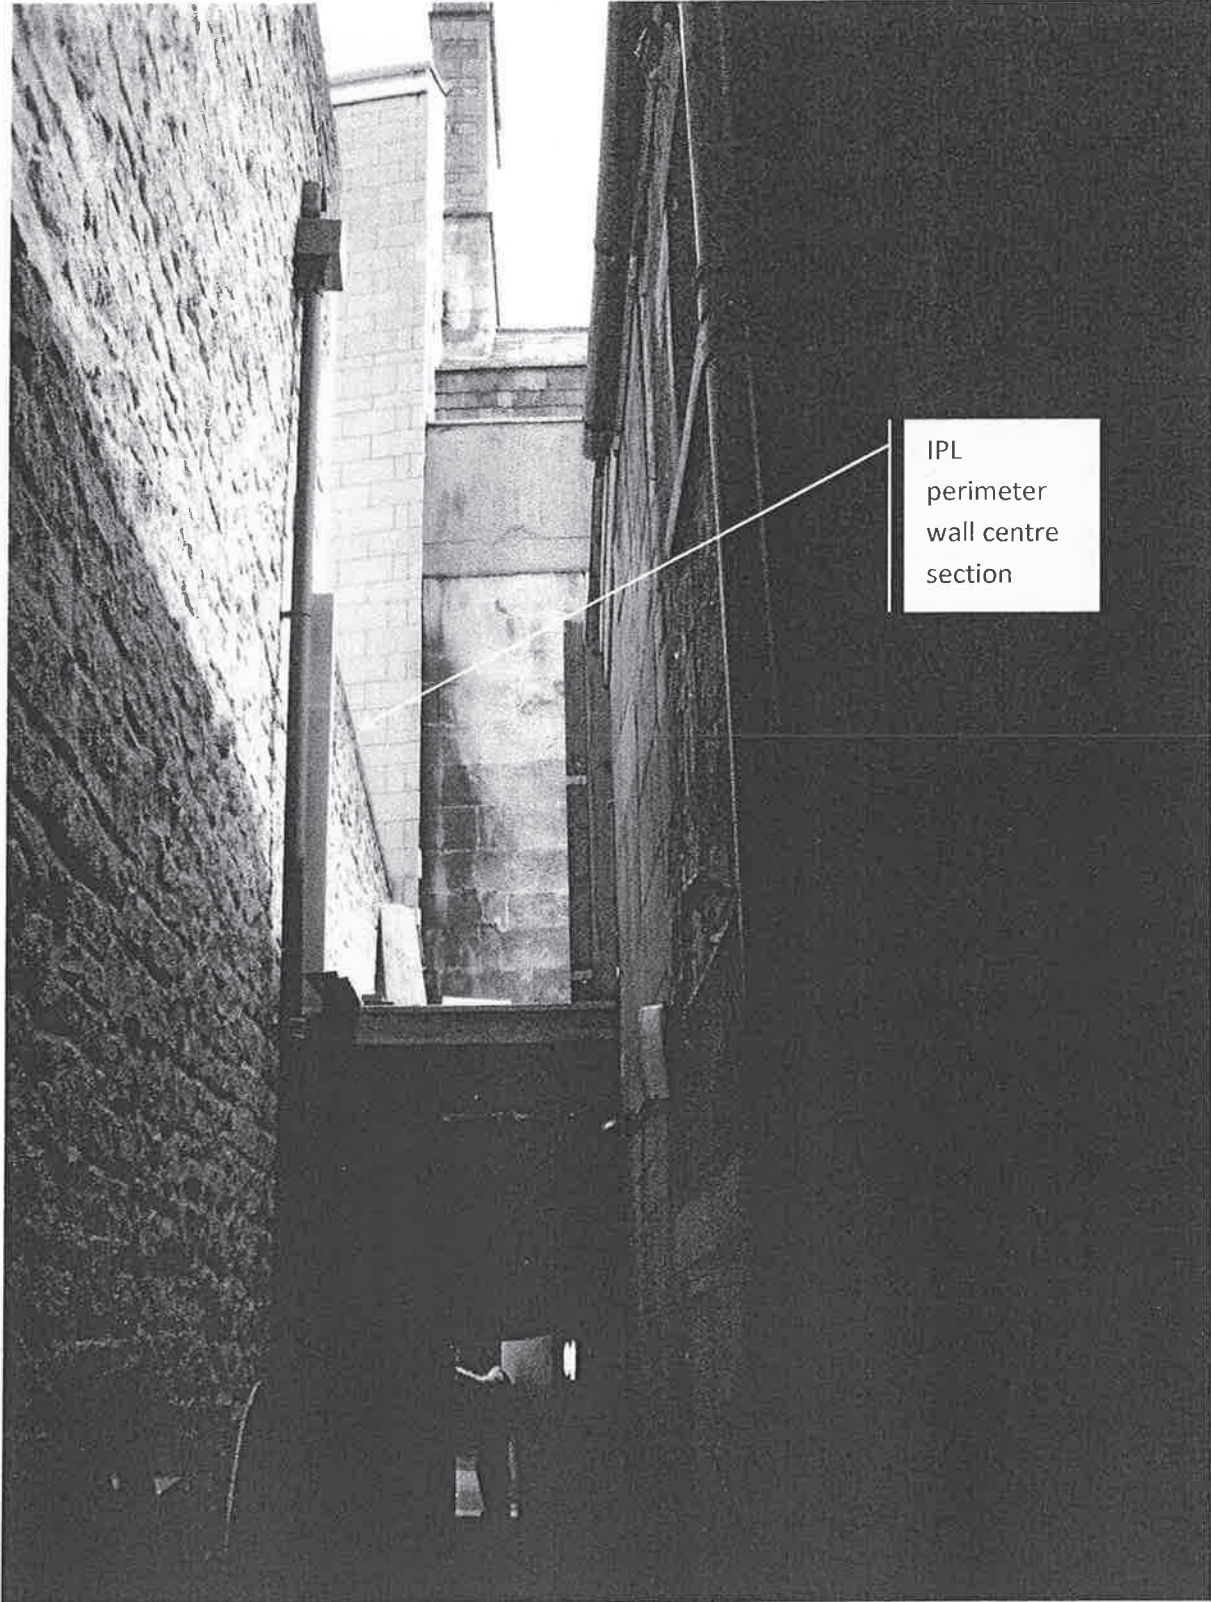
Terraced area showing approximate height below IPL Perimeter wall and easy access into and onto neighbouring properties
